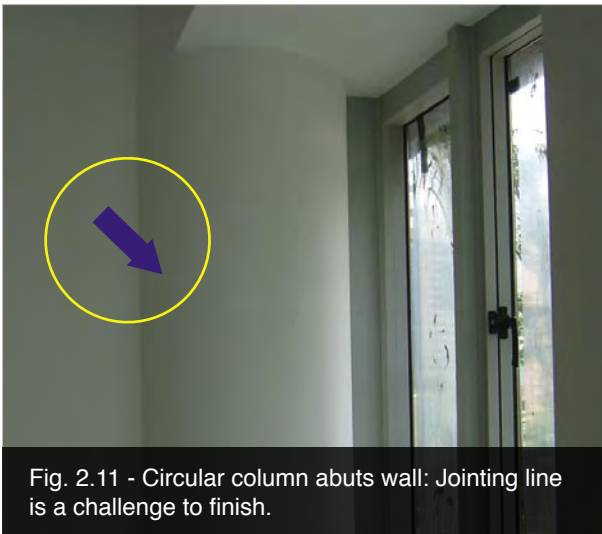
Circular column abuts wall: Jointing line is a challenge to finish.
